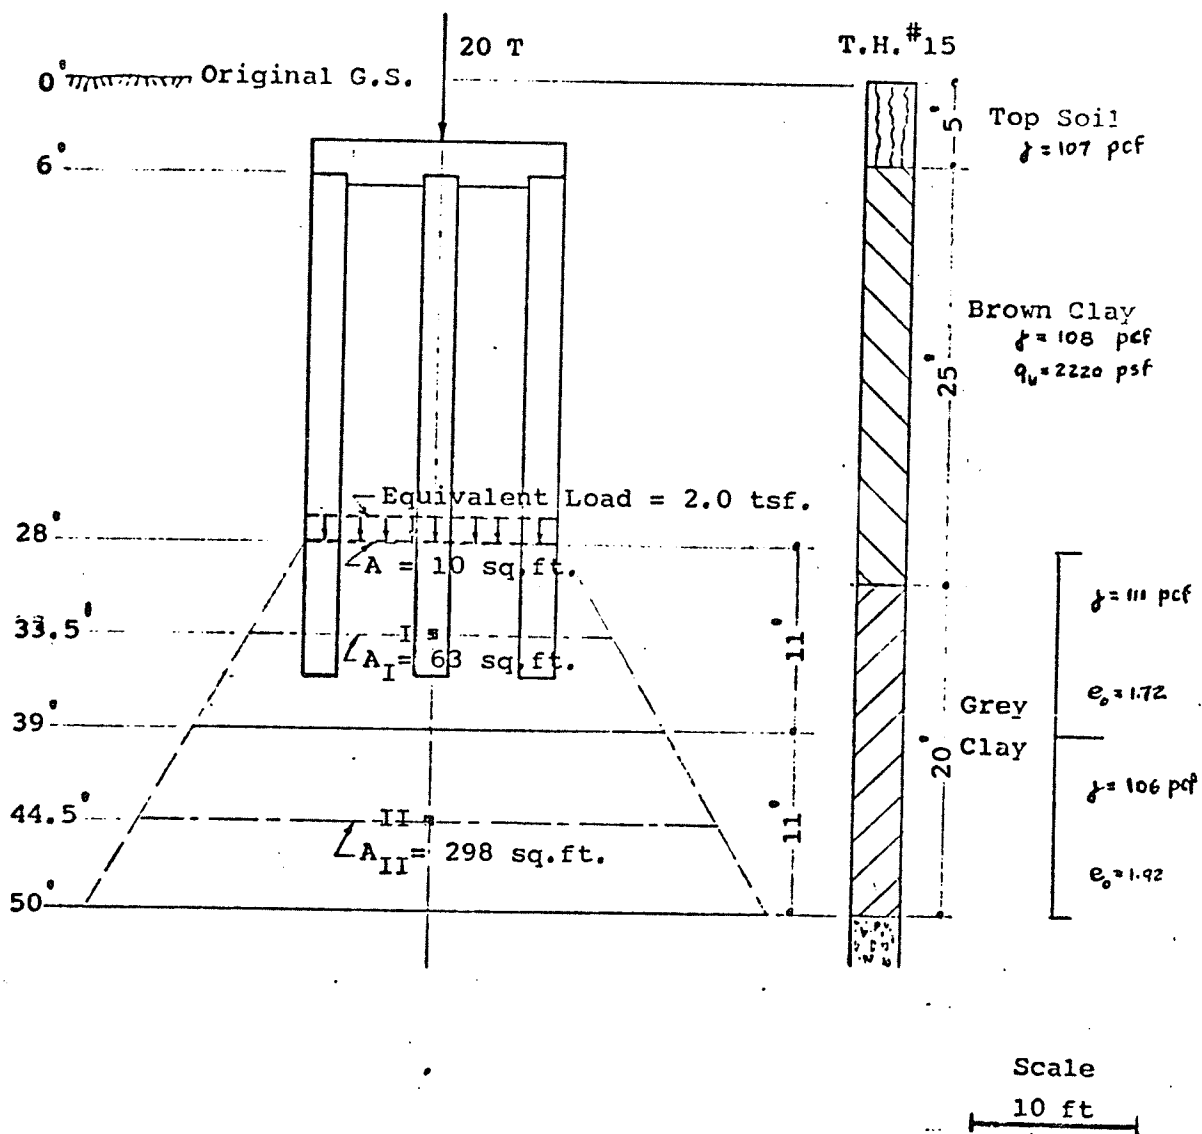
Soil Sub-division Under Pile Foundation 1
